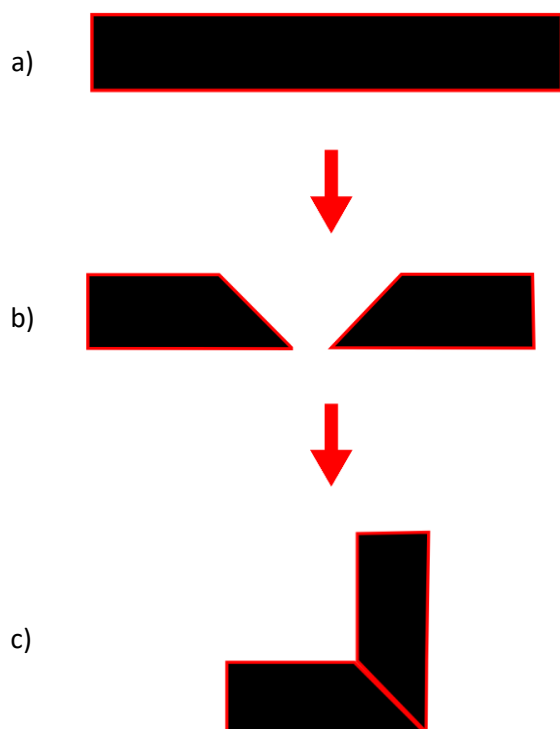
The installation of cavity barriers at corners align with the manufacturer's guidelines.
